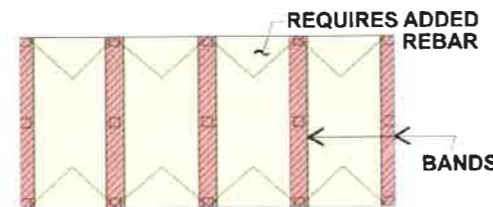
A-6 Tendon Layout for Non-Aligned Columns
